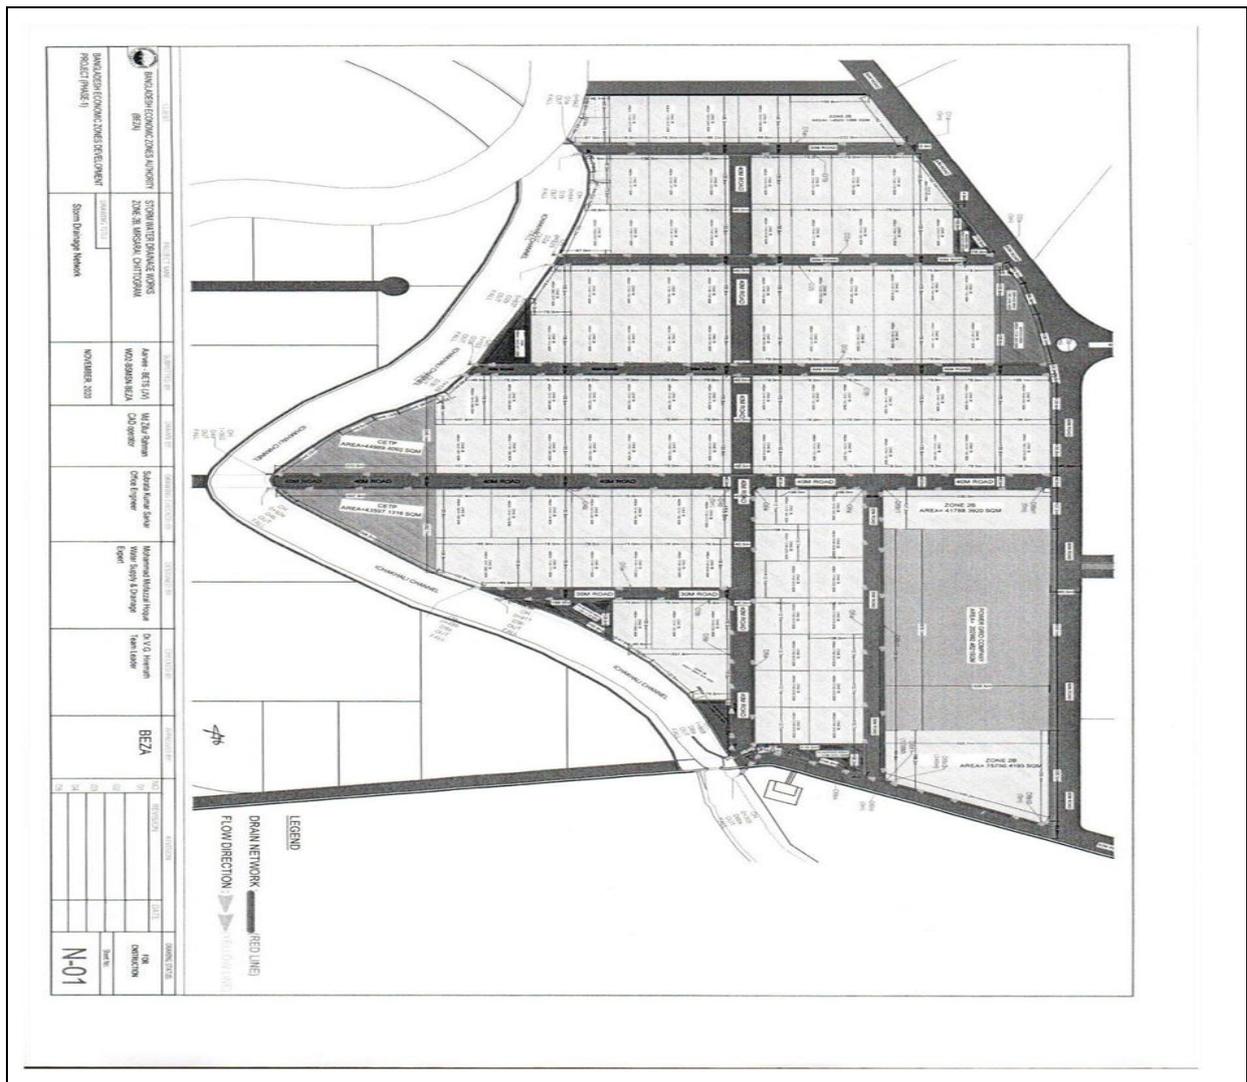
Layout Plan of storm water drainage (2B Zone)
